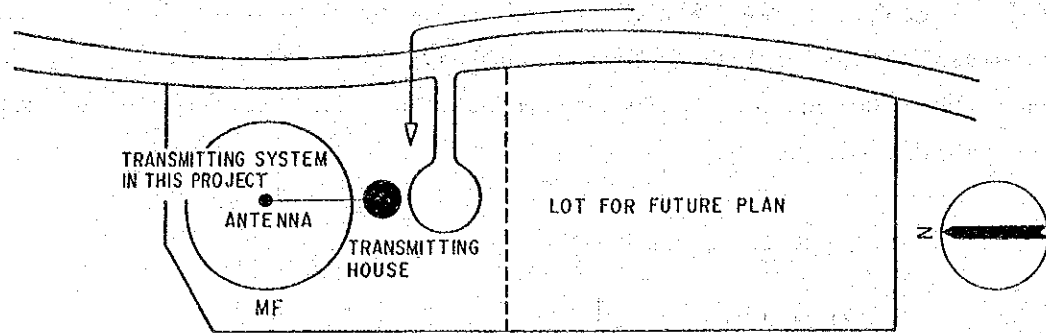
Facility Arrangement of Kigoma Transmitting Station
